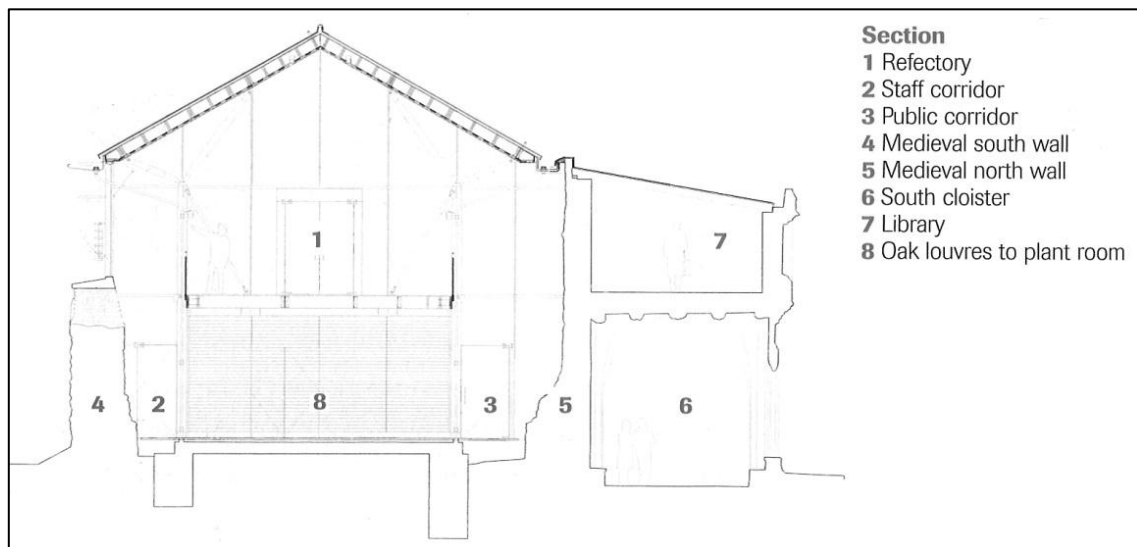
Section drawing of the Norwich Cathedral Refectory by Hopkins Architects (2009)
